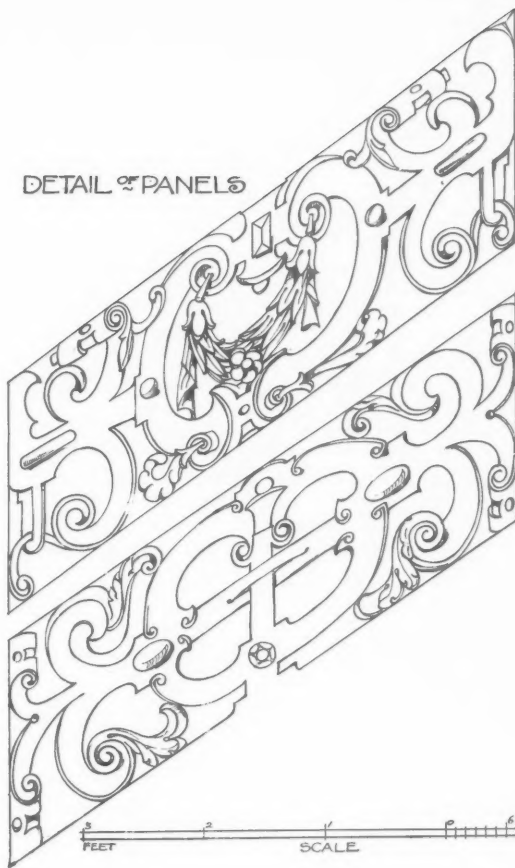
FIGURES ON STAIRCASE, CROMWELL HOUSE, HIGHGATE, LONDON, N.
